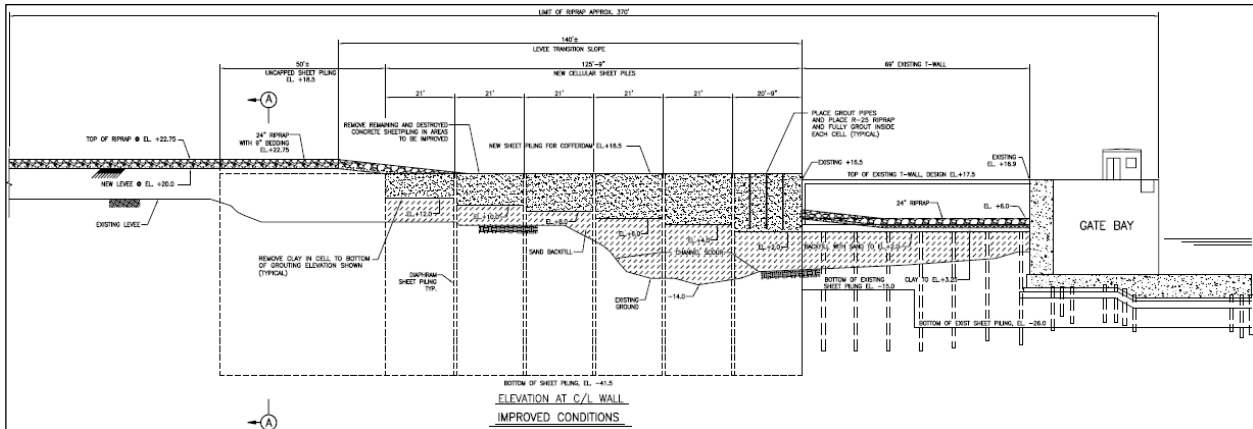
New Sheet Pile Diaphragm Wall Replacing Failed Uncapped I-wall at Bayou Bienvenue Control Structure (Note: this is same repair being done for northwest wall at Bayou Dupree)
